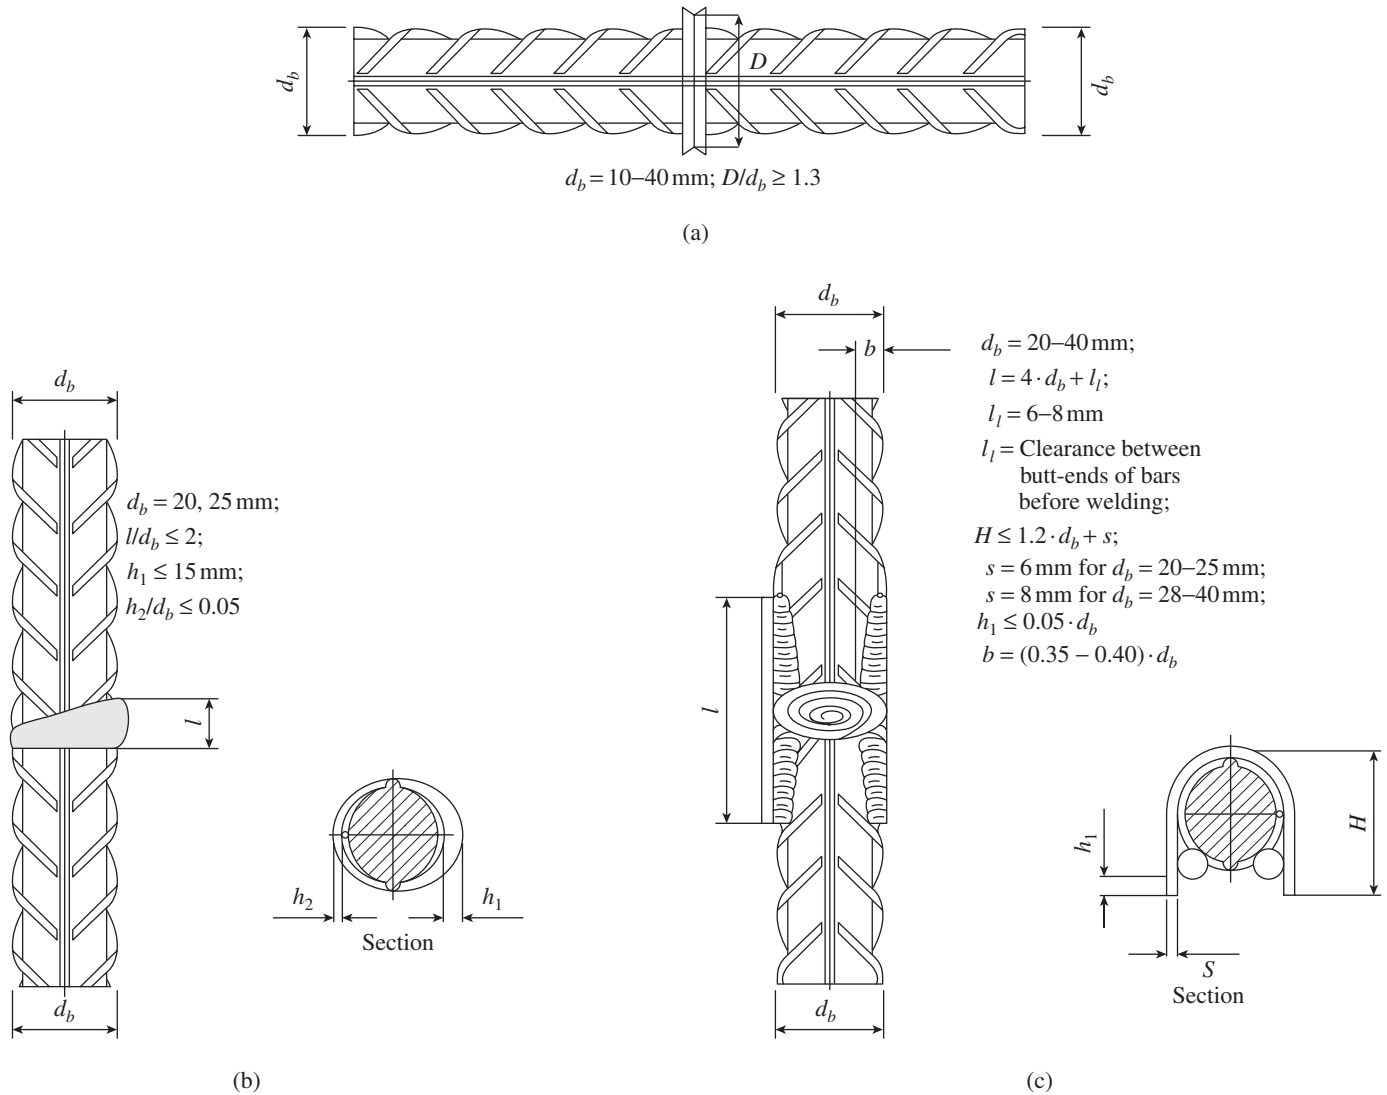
Details of welded butt joints (a) Flash welding (b) Enclosed welding (c) Enclosed welding with lap strap
